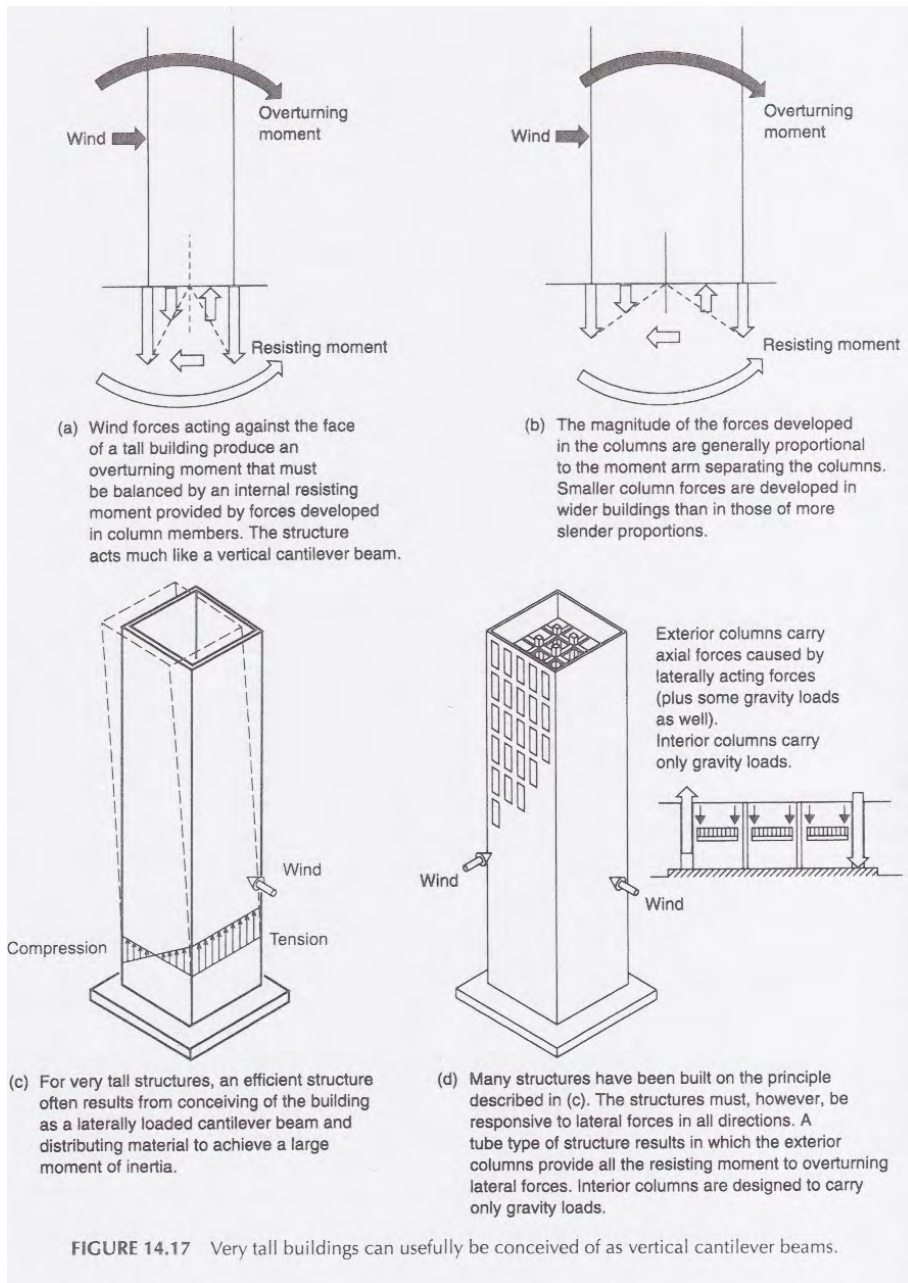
Very tall buildings can usefully be conceived of as vertical cantilever beams.
